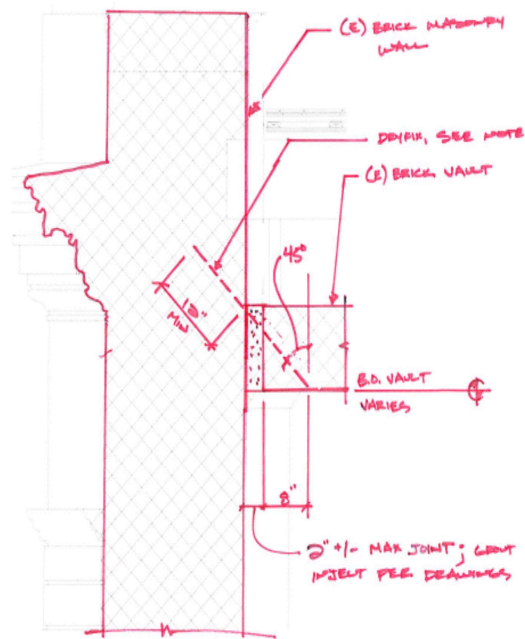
DETAIL - ARCH AT DOME TO VAULT TRANSITION
